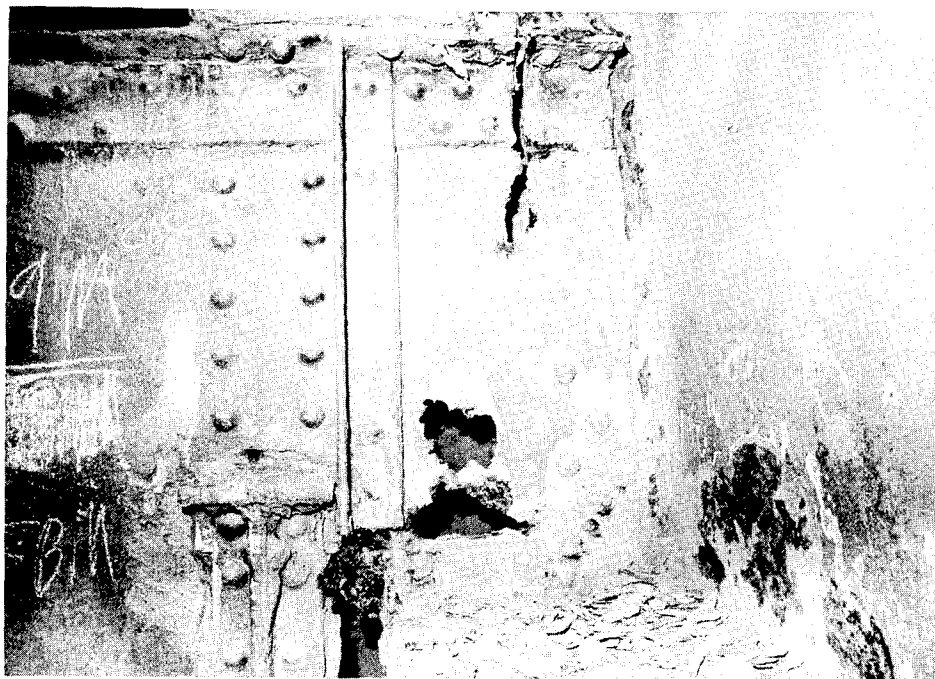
Corroded web penetrations between floor beam end connection and stringer seat angles at inner roadway.
